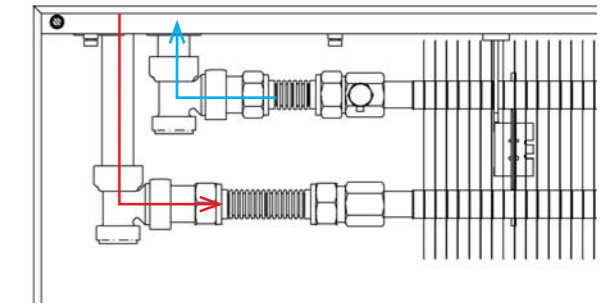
Side heating water connection - in the room (non-standard accessory - angular connection).
